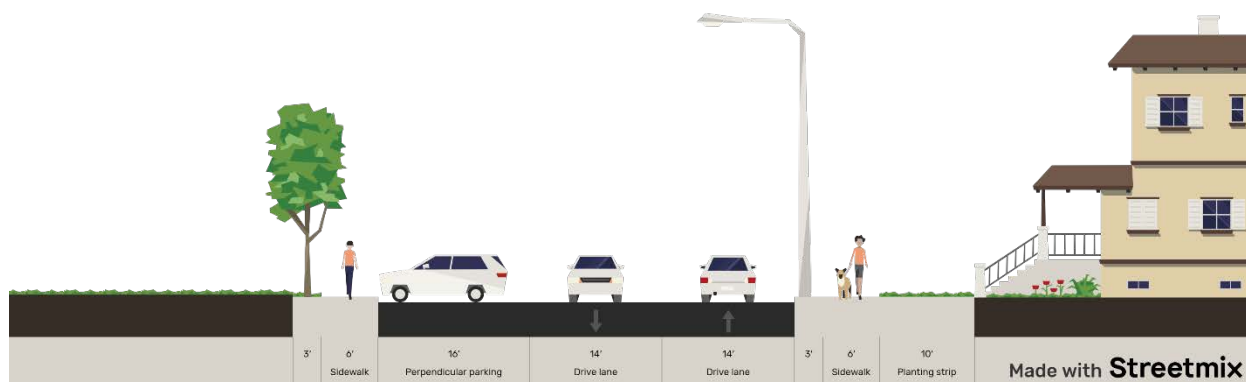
Street cross-section of Aberdeen Street looking north. The street has two drive lanes and a parking lot to the left of the street. Blackshear neighborhood residences and veteran are on the right. Diagram created in Streetmix by EC, 2022.
